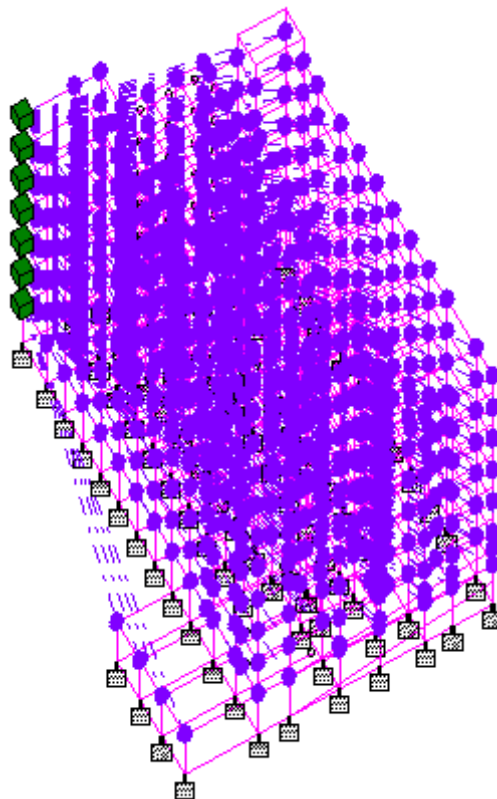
STAAD Model of Hospital Building (with diaphragm) in isometric view
